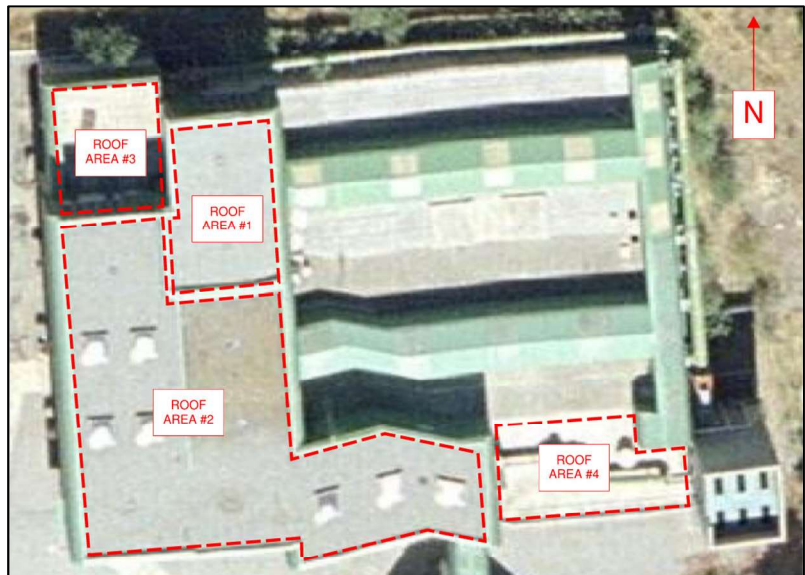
Primary Building at the Whistler Waste Water Treatment Plant.
